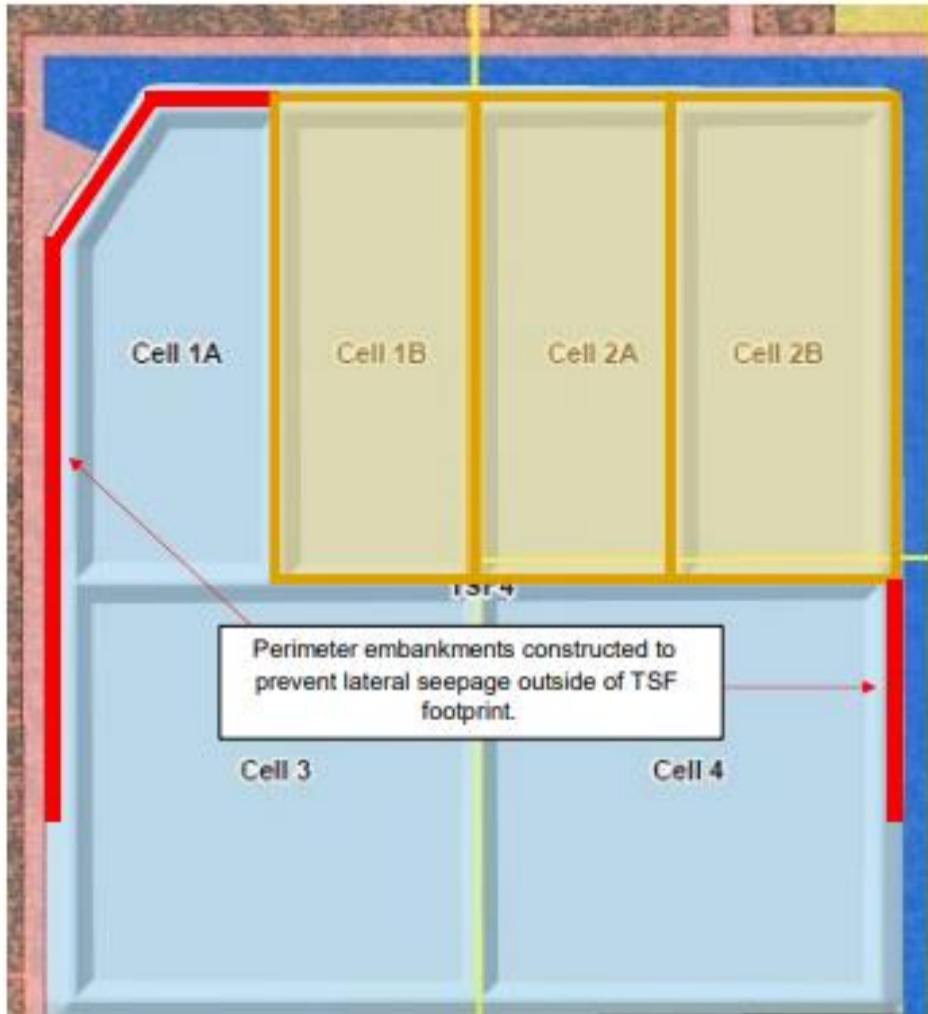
Plan showing Stage 3 of the TSF construction – Cell 1B construction
